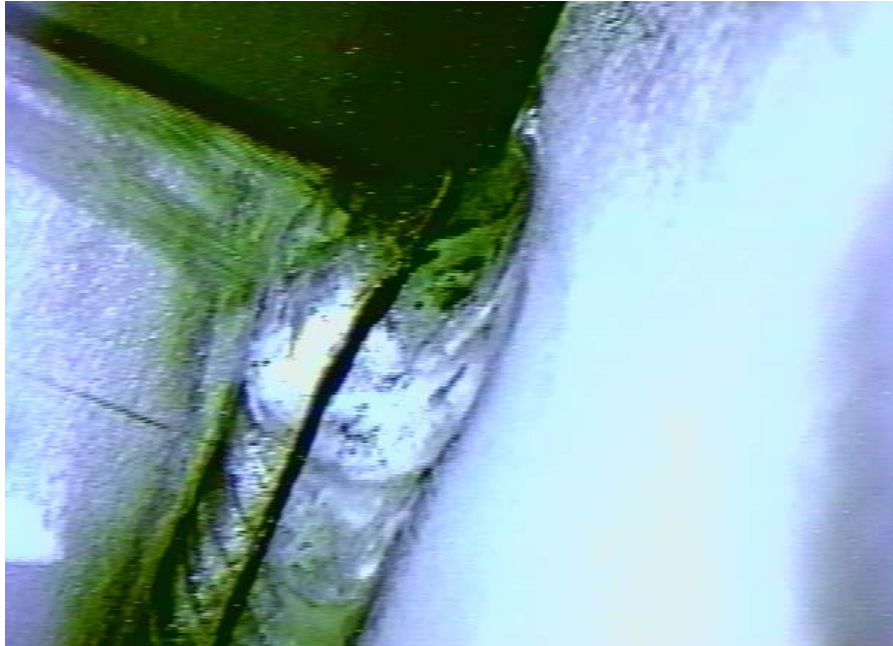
Top weld crack at location 10 identified in Figure B-19.
